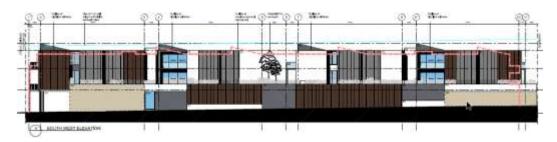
South West Elevation of DA 10.2017.116.1 – amended plans (Pink line shows DA 10.2012.264.1)
